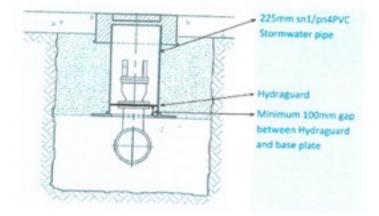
COMPLETED HYDRAGUARD ASSEMBLY
